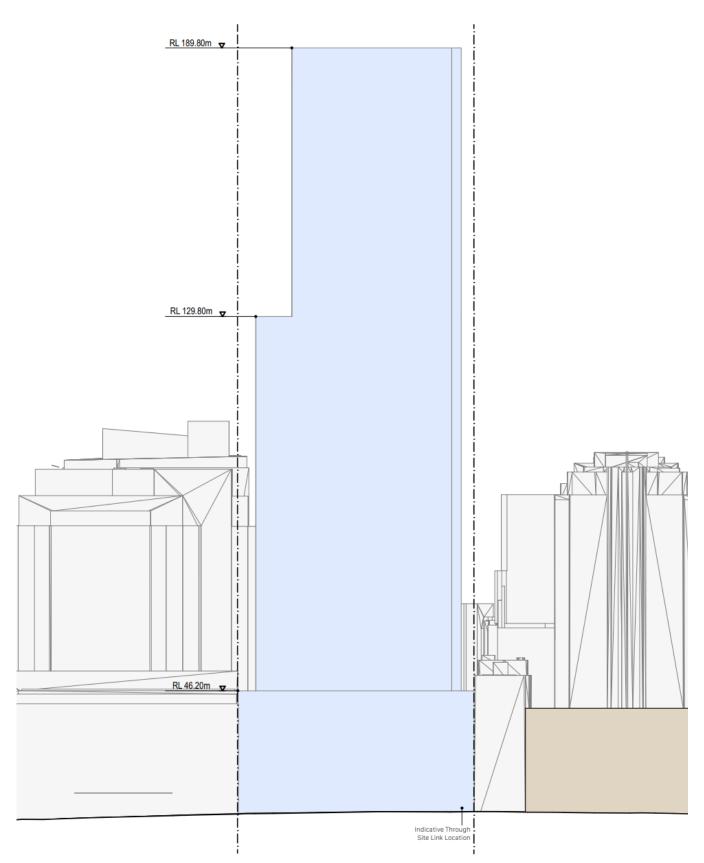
Proposed Planning Envelope Elevation at Kent Street
